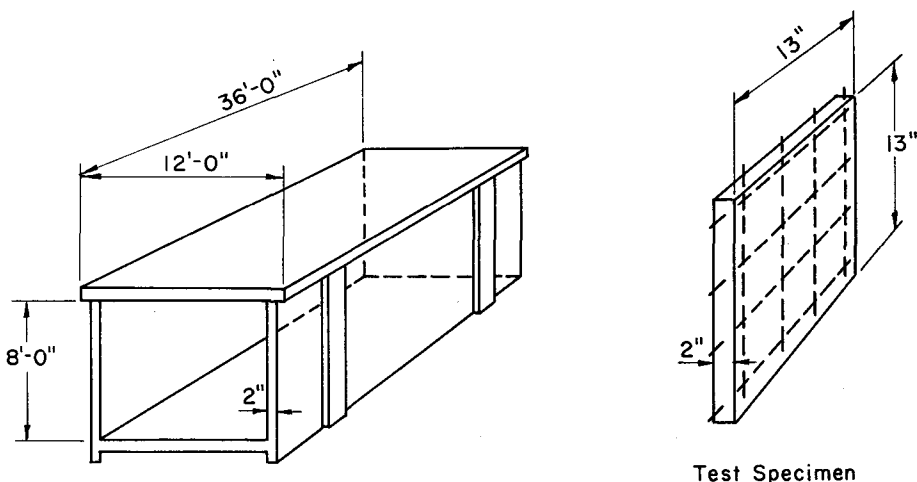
Typical precast building unit with test specimen (right) to simulate wall behavior
